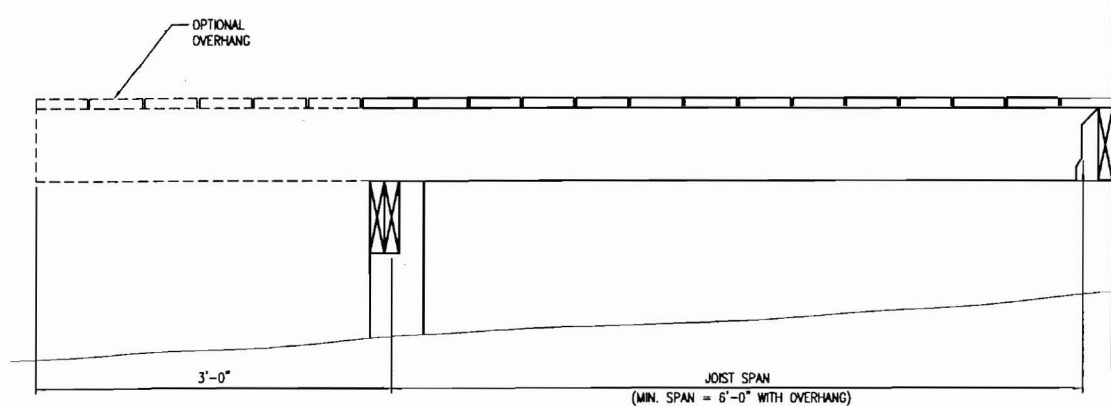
JOIST SPAN - DECK ATTACHED AT HOUSE
